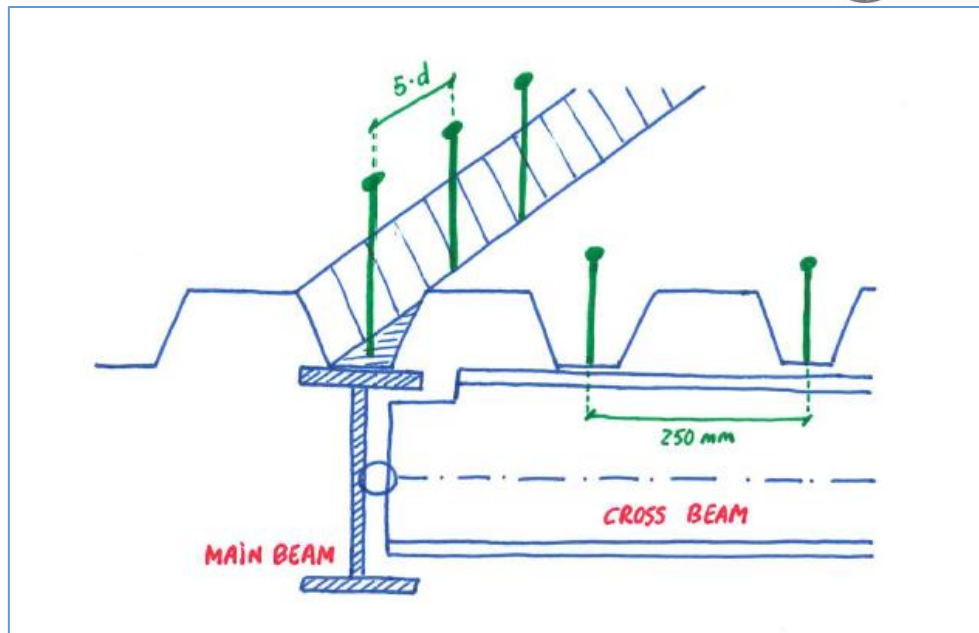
This draw is useful to see the disposition of the shear studs in the Cross Beam and in Main Beam. It can be appreciated also why, while in the cross beams the separation between the studs had to be 250mm or some multiple number like 500, 750..., and in the main beam that is not necessary because the whole beam matches with the wave of the trapezoidal sheeting. That is the reason why the only condition that it must comply is that the separation is bigger than $5 \cdot d$.
